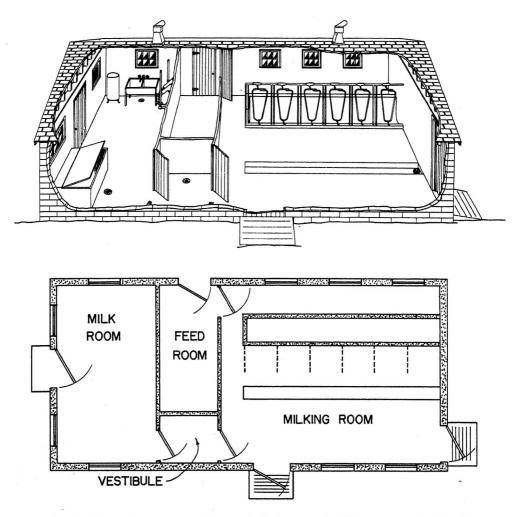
Floor level type, combination milk house and milking barn (Mo. Plan No. 8-723-C1).
